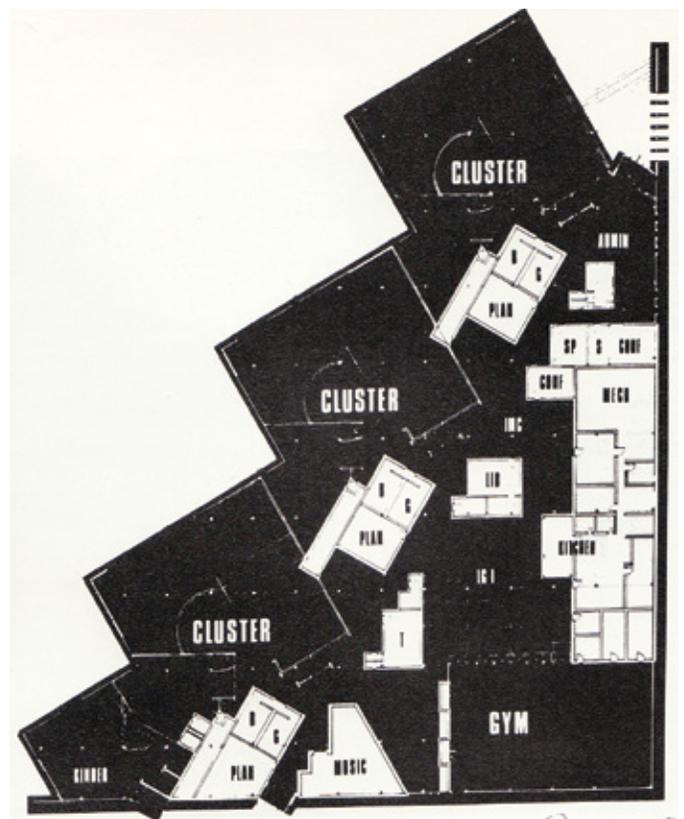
| Mt. Healthy Elementary School – Floor Plan Diagram
